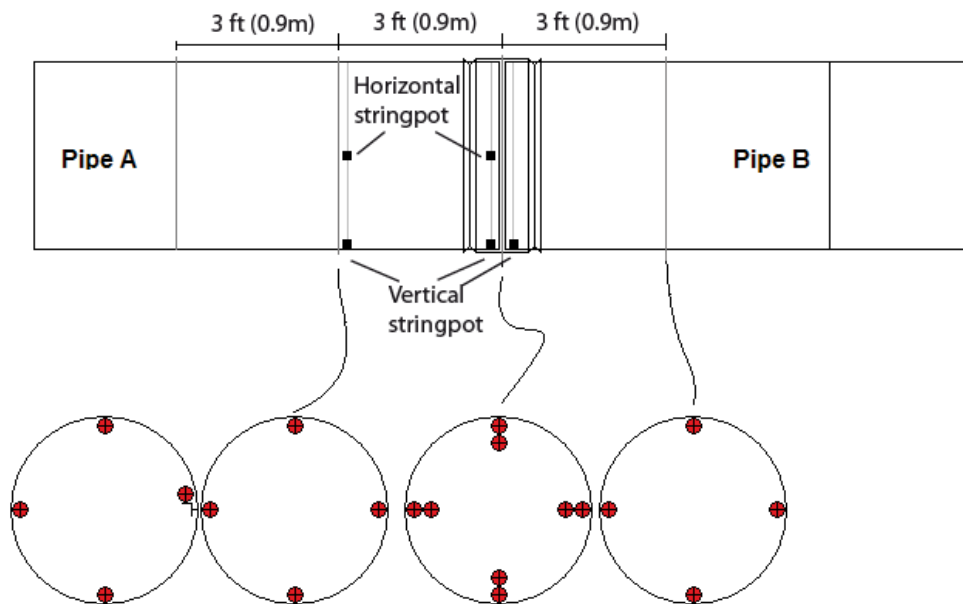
Reflective prism and string potentiometer scheme for the 36 in. (915mm) diameter corrugated steel pipe without O-rings.
